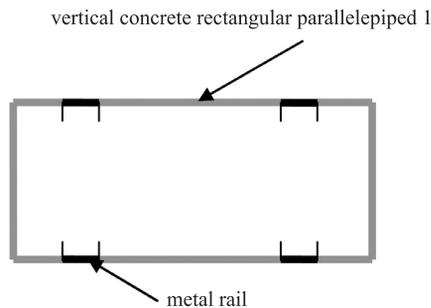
Positioning the rails inside the vertical concrete rectangular parallelepiped 1 – indicative scheme vertical concret
